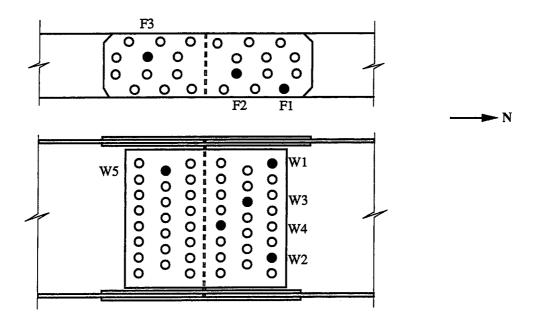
(a) Location of sampled bolts in connection N2 of bridge B2
